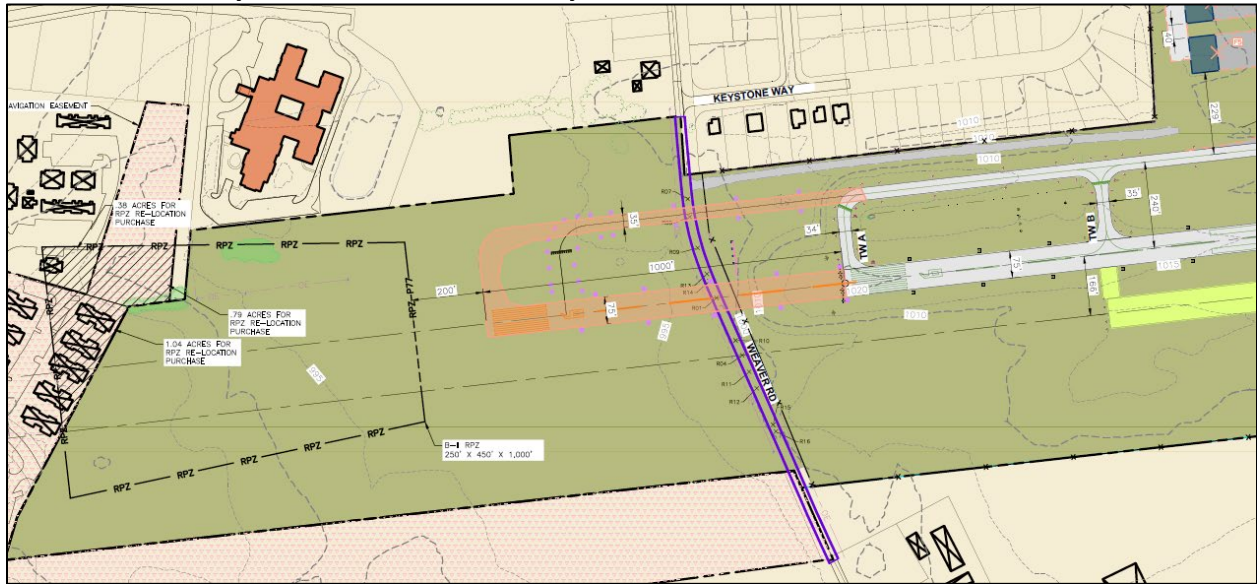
Runway Alternative 1: 800' Runway Extension
